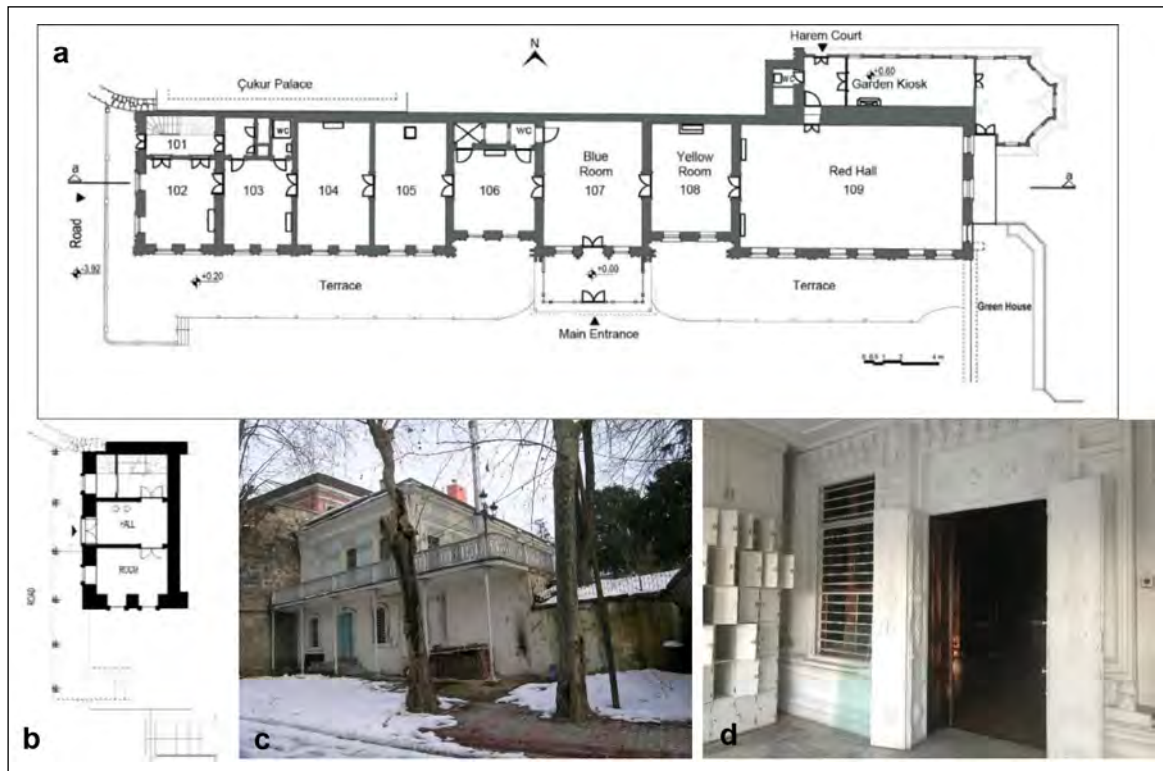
(a) The main floor plan of the Çit Kasrı, (b) The basement floor plan, (c) The Western facade from the road, 2006, (d) The main door from the Mabeyn Courtyard, 2017 (Erdem).
